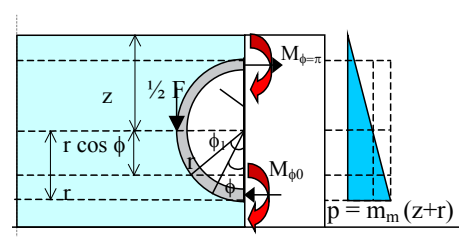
Loads acting on infill element during construction the infill is fixed to the mould at the side.
